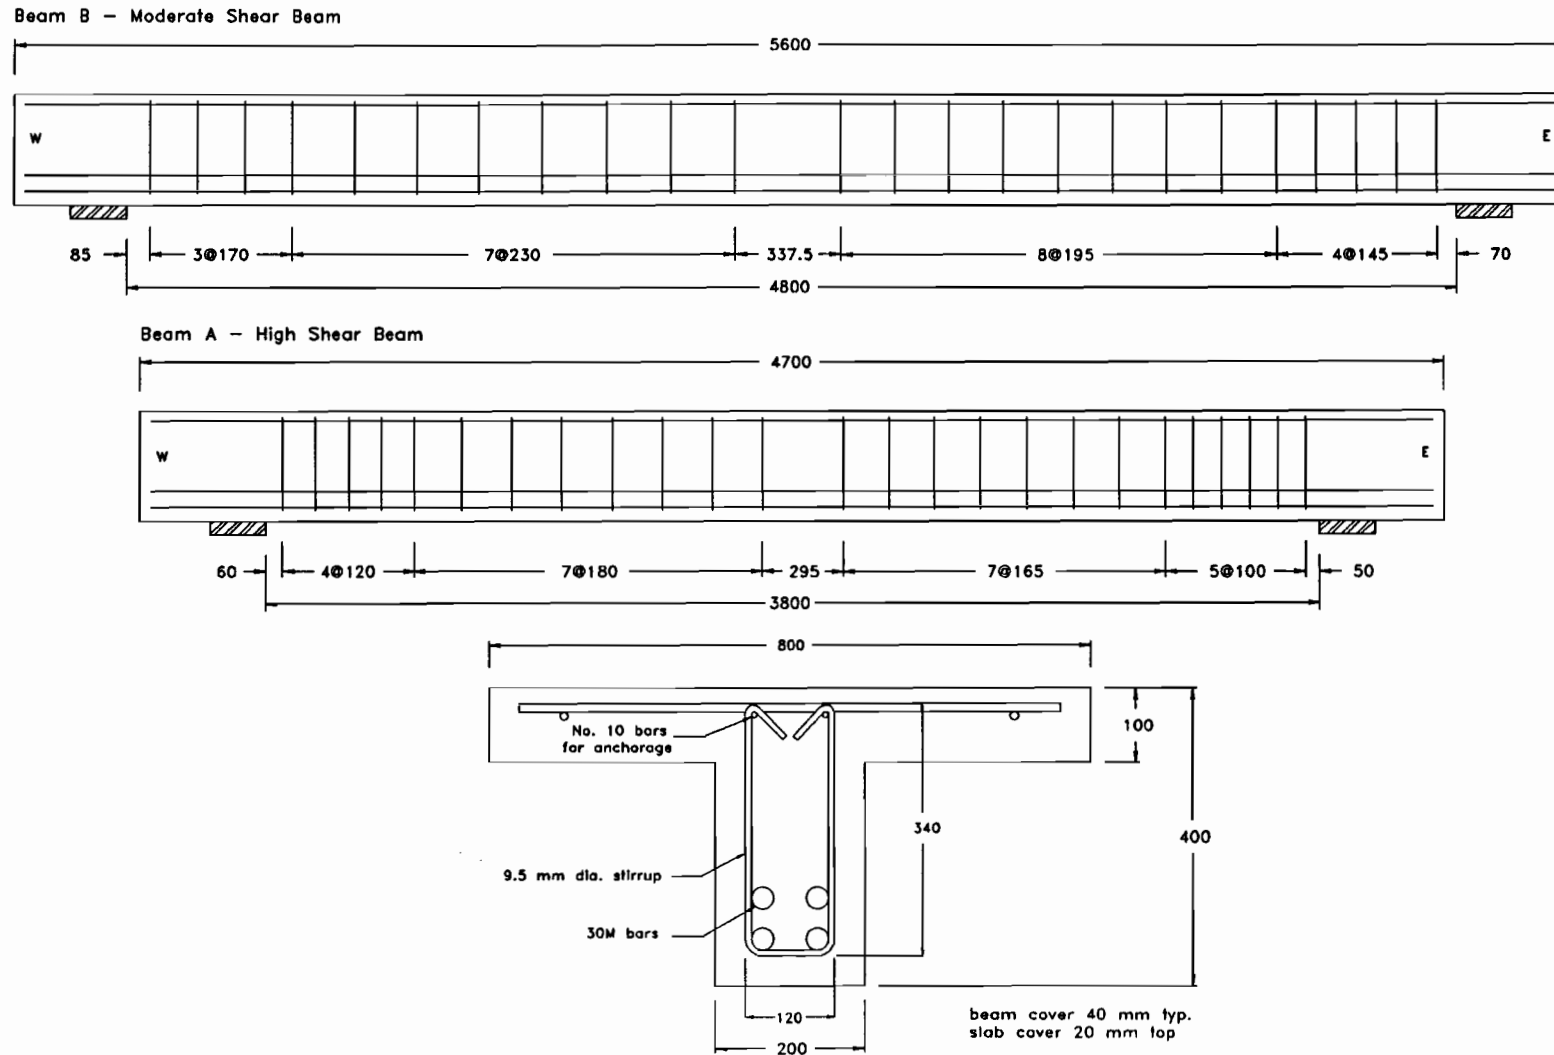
Reinforcement details of companion beams tested by Mailhot (Ref. 27)
